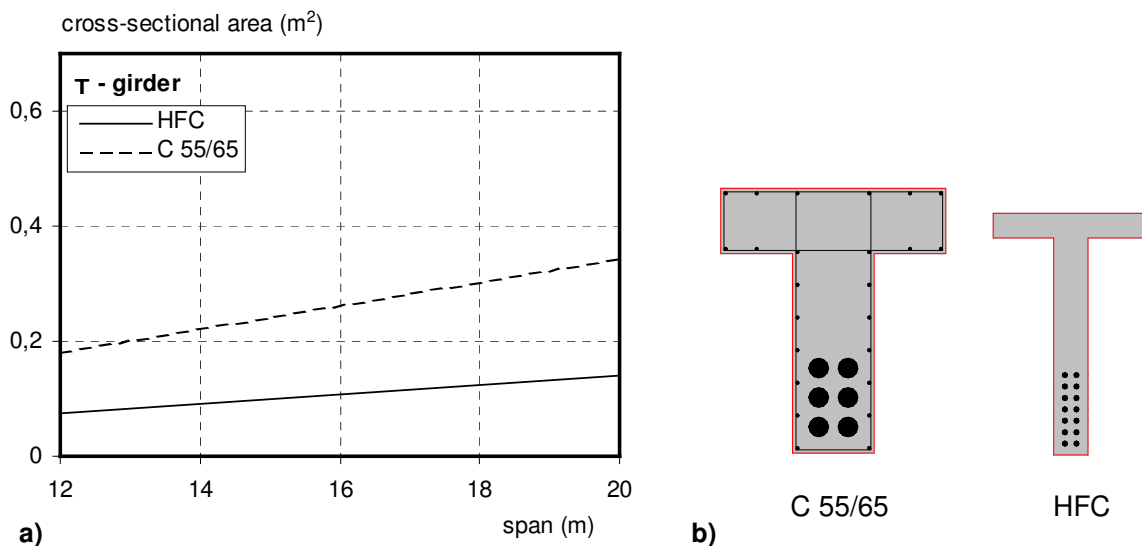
a) The relation between span and cross-sectional area of T girders made of Hybrid-Fibre Concrete (HFC) and of conventional reinforced concrete C 55/65; b) The scheme of the cross-sections of girders in HFC and C55/65
